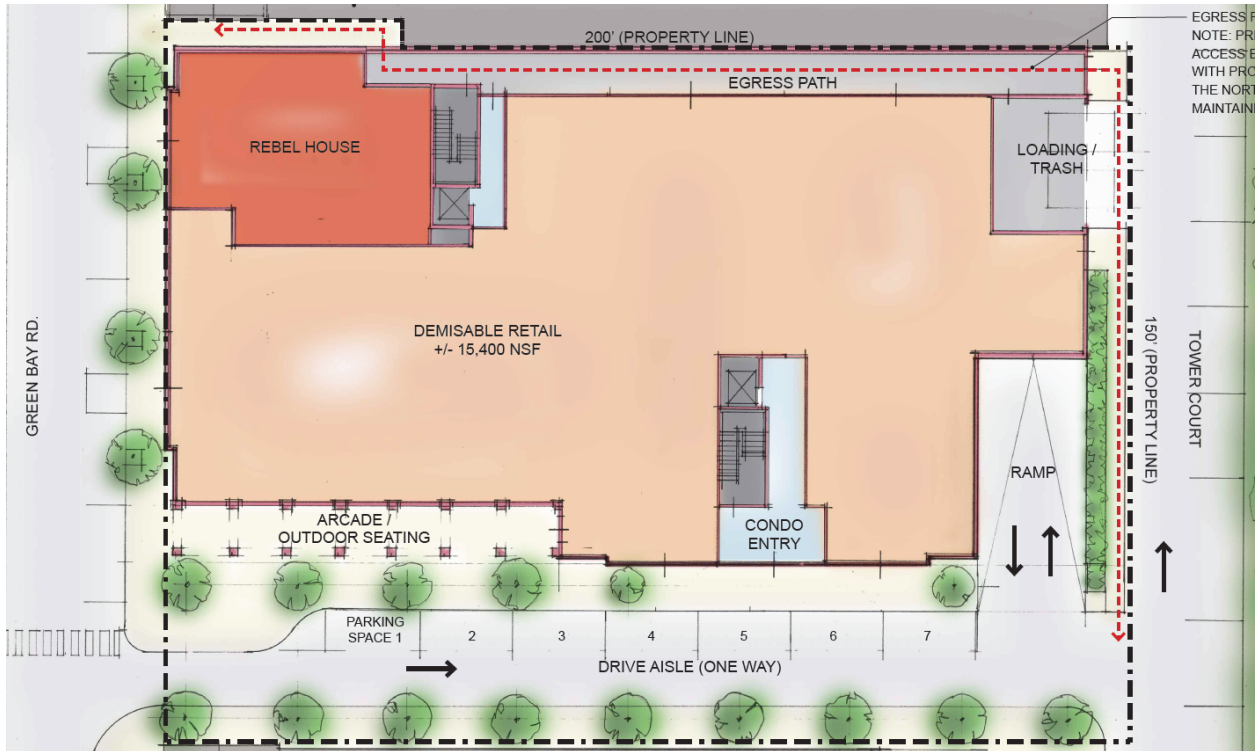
Concept Plan – Ground Floor Plan Presented to Council October 21, 2025
